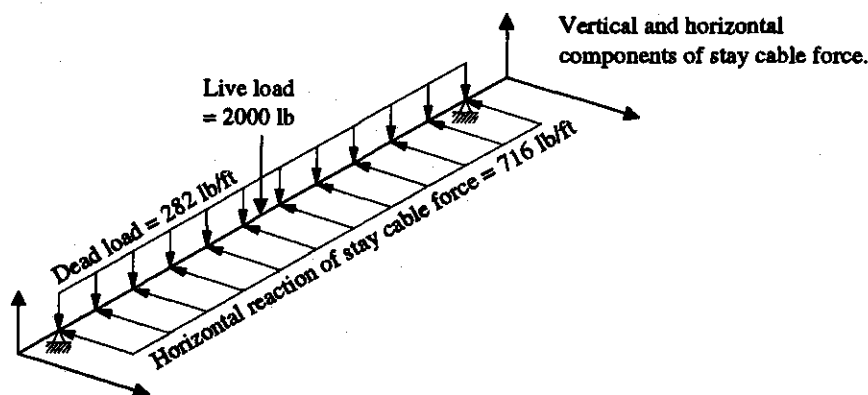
Vertical and Horizontal Forces on Transverse Floor Beam
